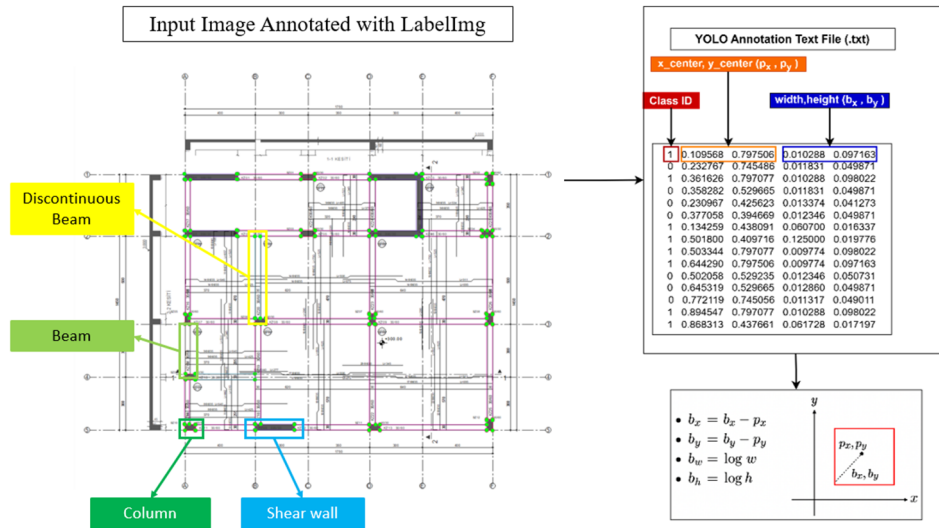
YOLO annotation pipeline for structural elements in structural floor plans
